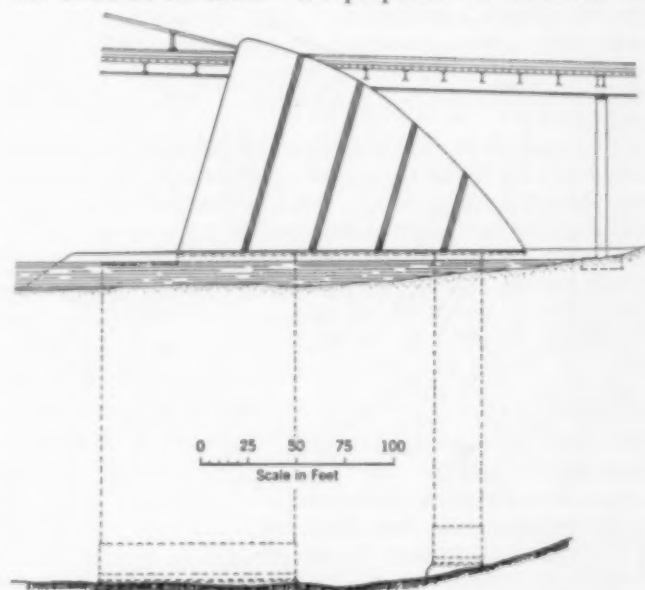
DESIGN FOR ANCHORAGE OF WHITESTONE BRIDGE
